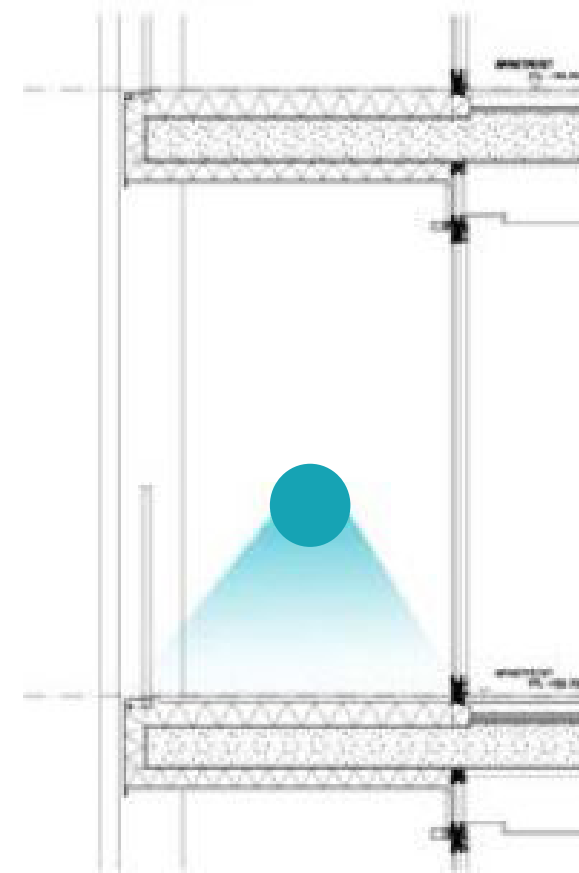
Balcony cross section illustrating wall mounted light fixture
